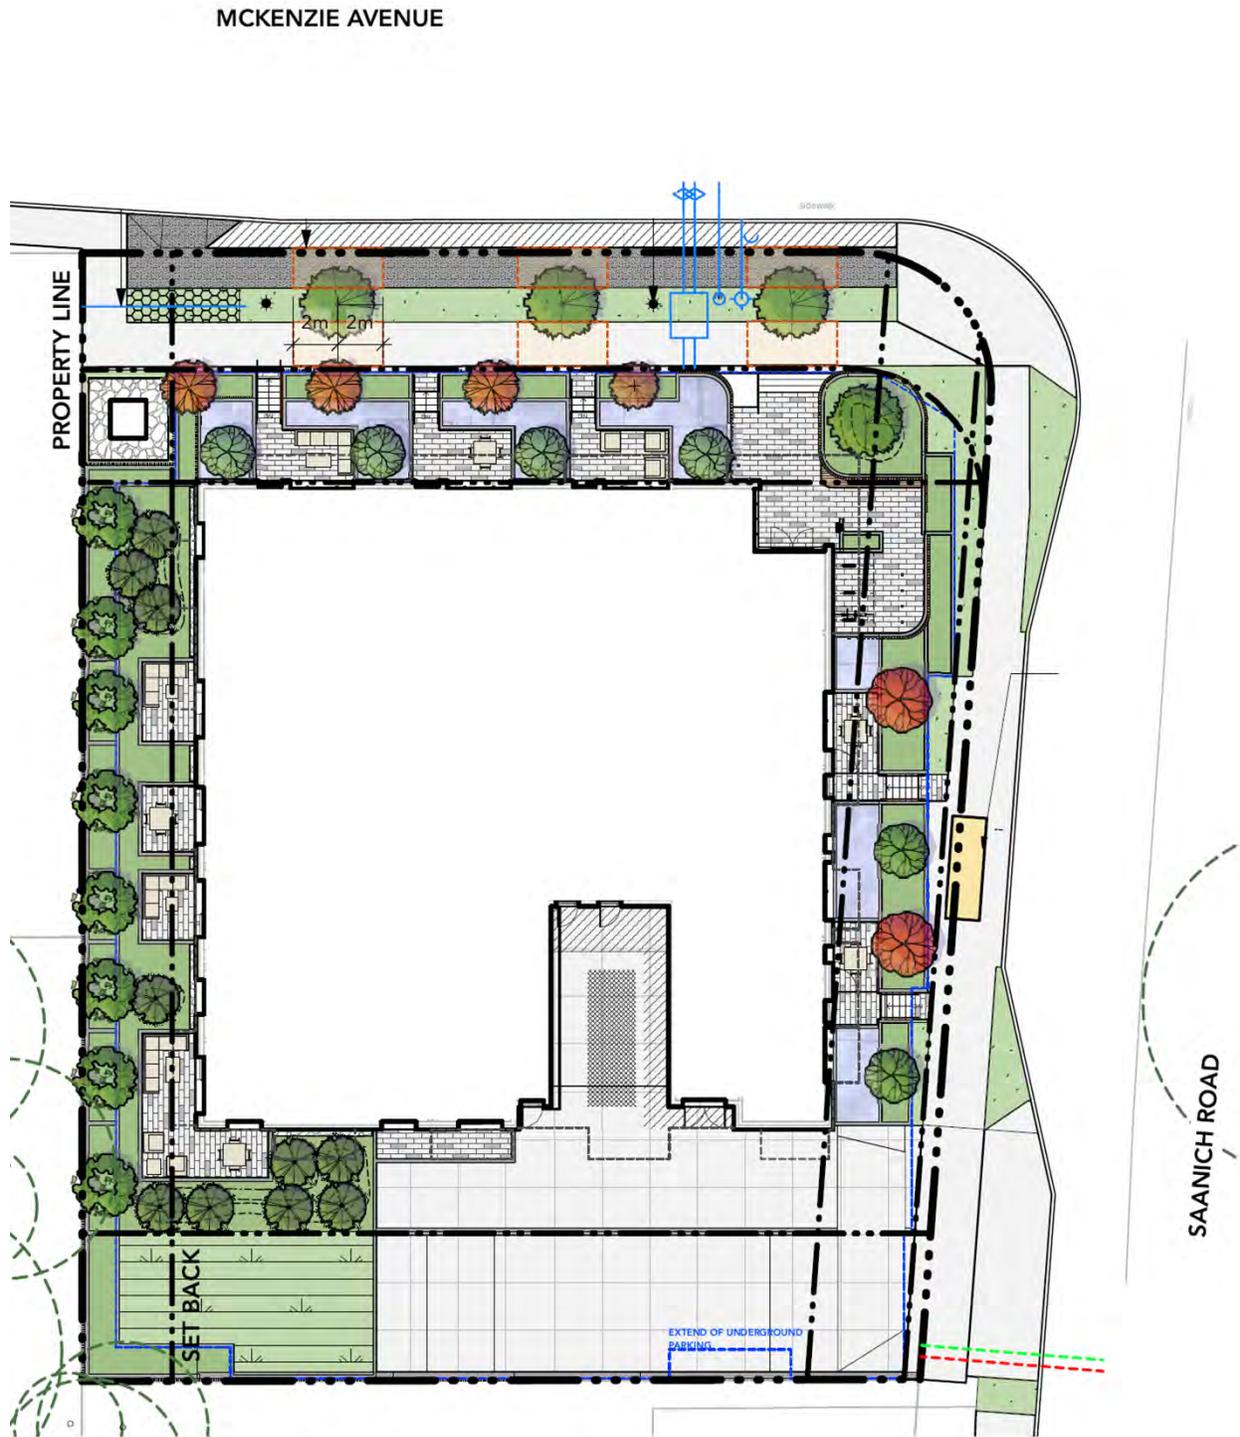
Landscape Plan. Adapted. From plans by Gauthier & Associates Landscape Architects Inc.
